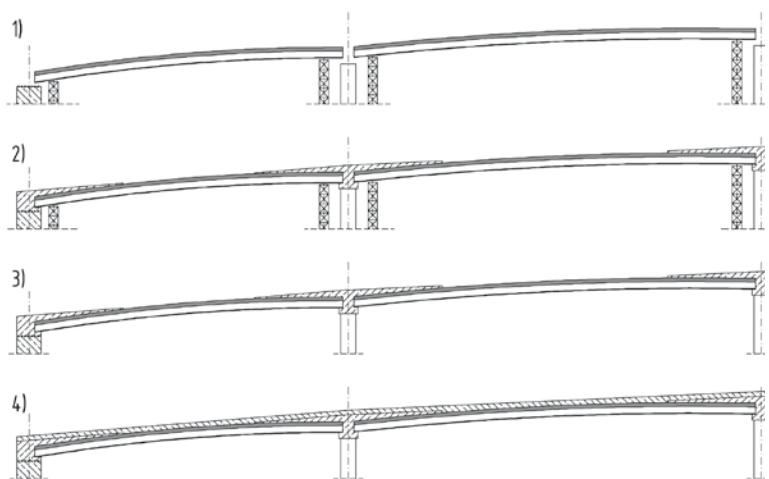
, Exemplary construction process of wildlife bridge with pre-concreted framing corner
